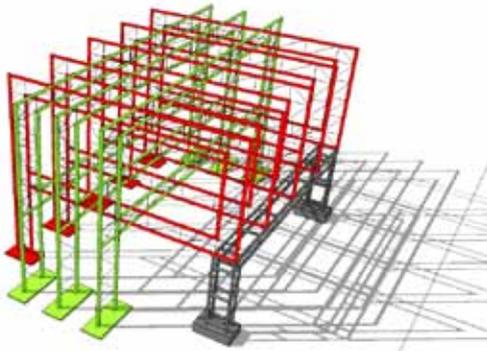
diagram of secondary steel trusses spanning the length of the structure. trusses are supported on both sides.
